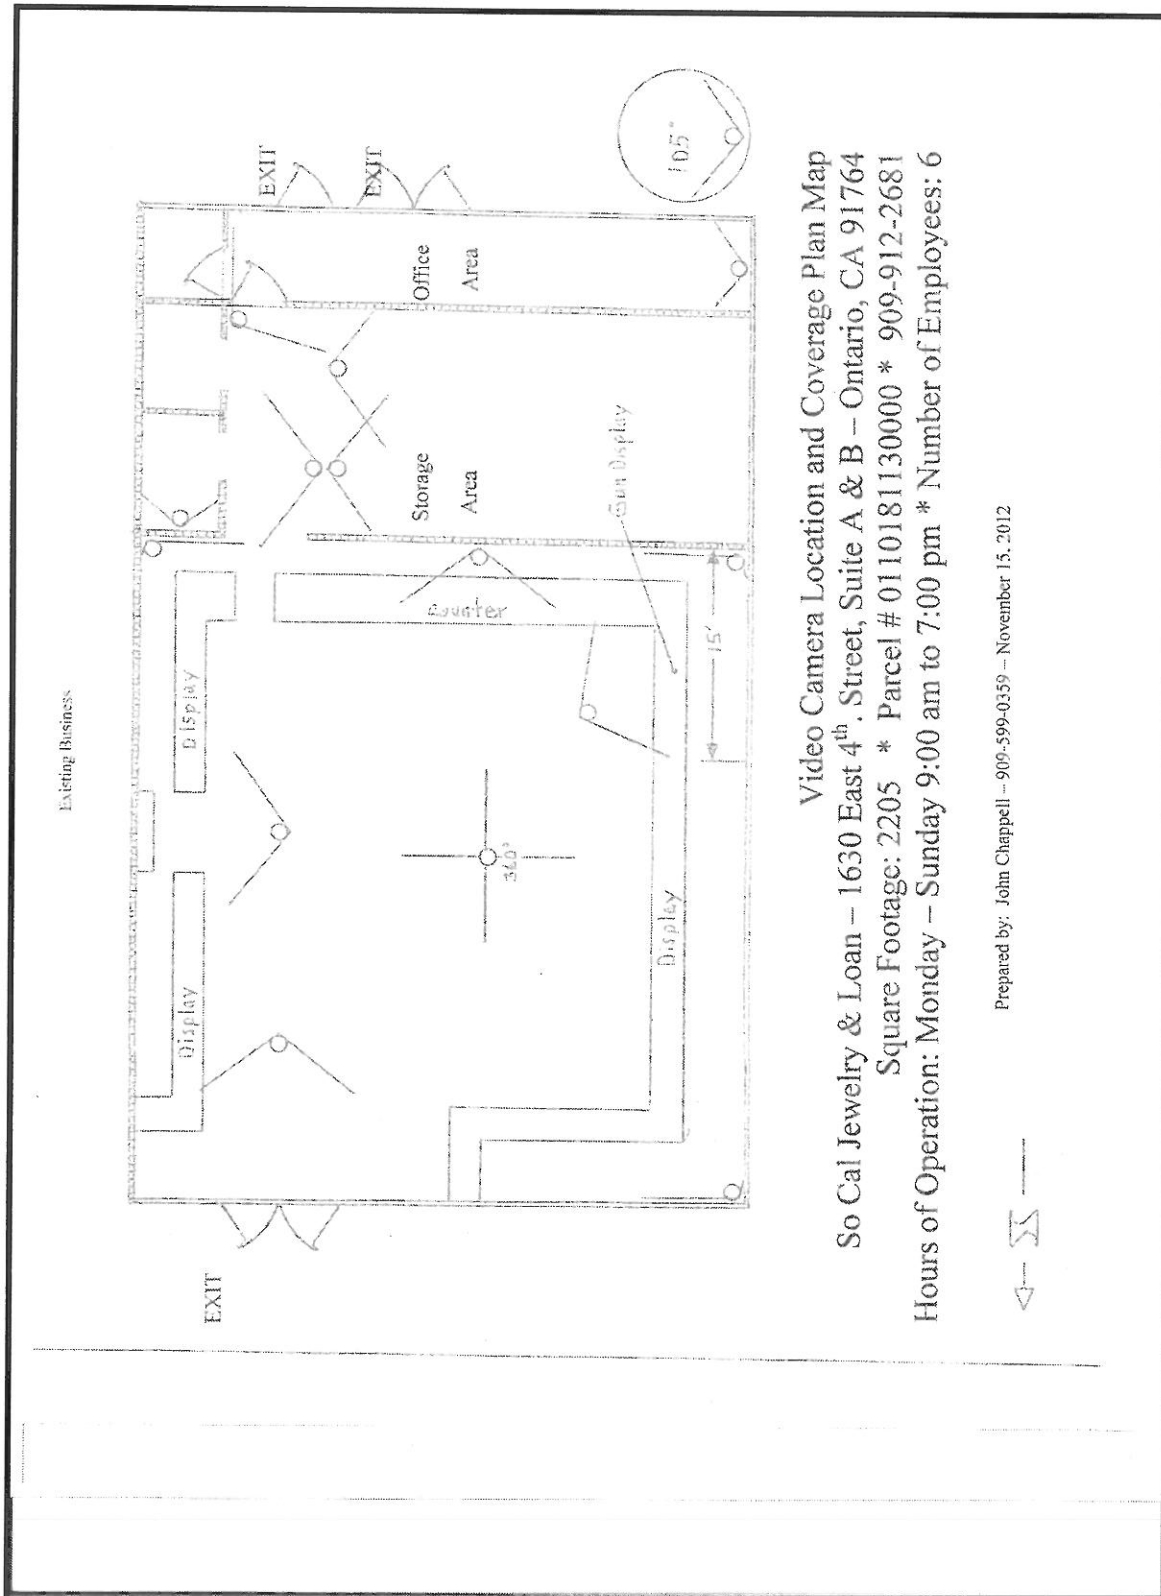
Exhibit D: Proposed Floor Plan (Tenant Space AB)
